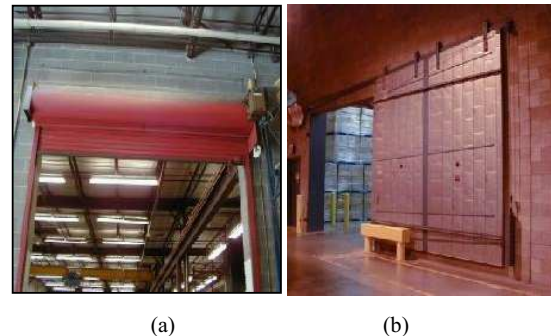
Fire Door (a) Vertical ("Roll-Up") Fire Doors (b) Horizontal ("Sliding") Fire Door
